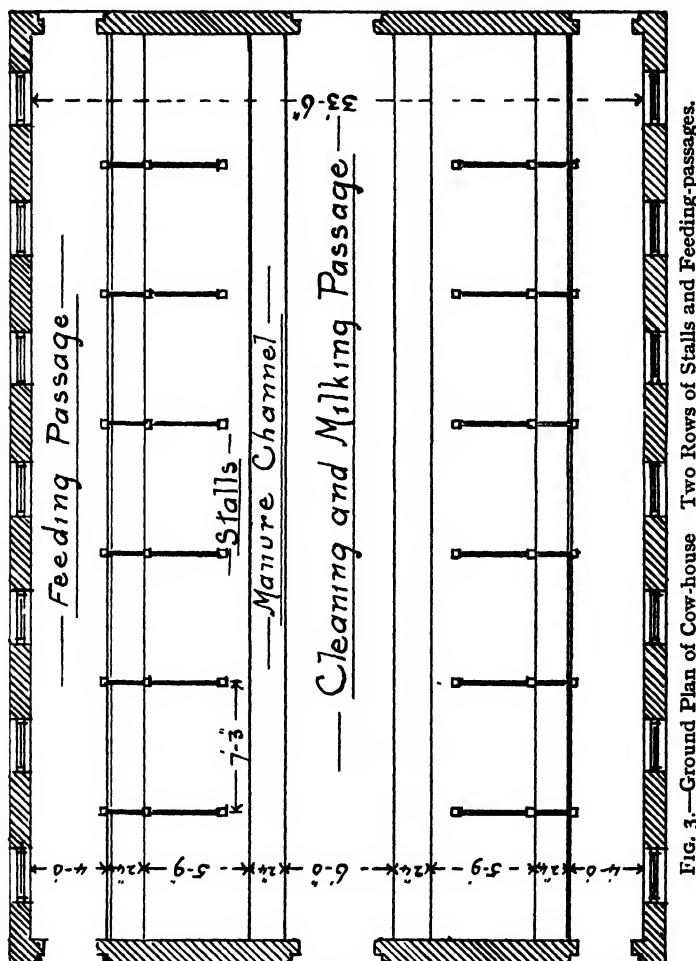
Ground Plan of Cow-house Two Rows of Stalls and Feeding-passages.
